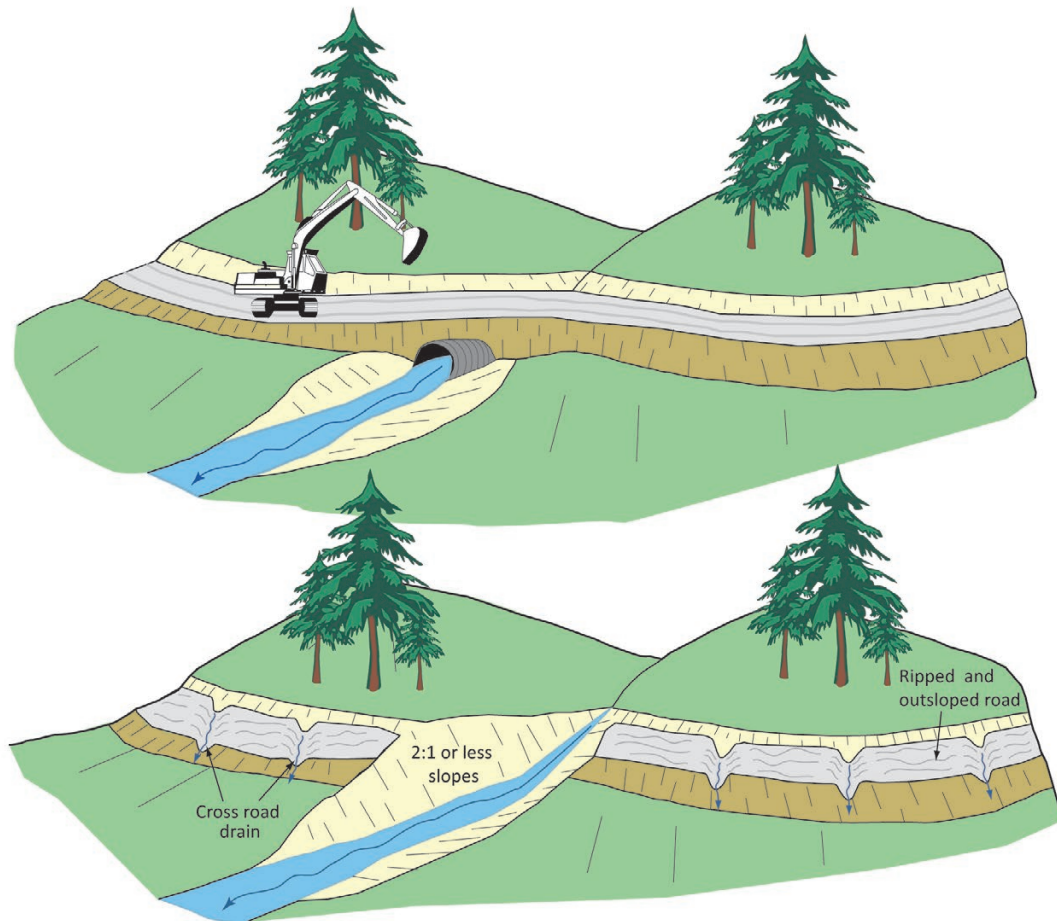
On roads that are to be closed (decommissioned), all stream crossing culverts and fills should be removed. Stream crossing excavations are best performed using an excavator. The original channel should be excavated and exhumed down to the former streambed, with a channel width equal or greater than the natural channel above and below the crossing. Sideslopes should be laid back to a stable angle, typically a 2:1 (50%) gradient, or less. Spoil can be endhauled off-site or stored on the road bench adjacent the crossing, provided it is placed and stabilized where it will not erode or fail and enter the stream.
